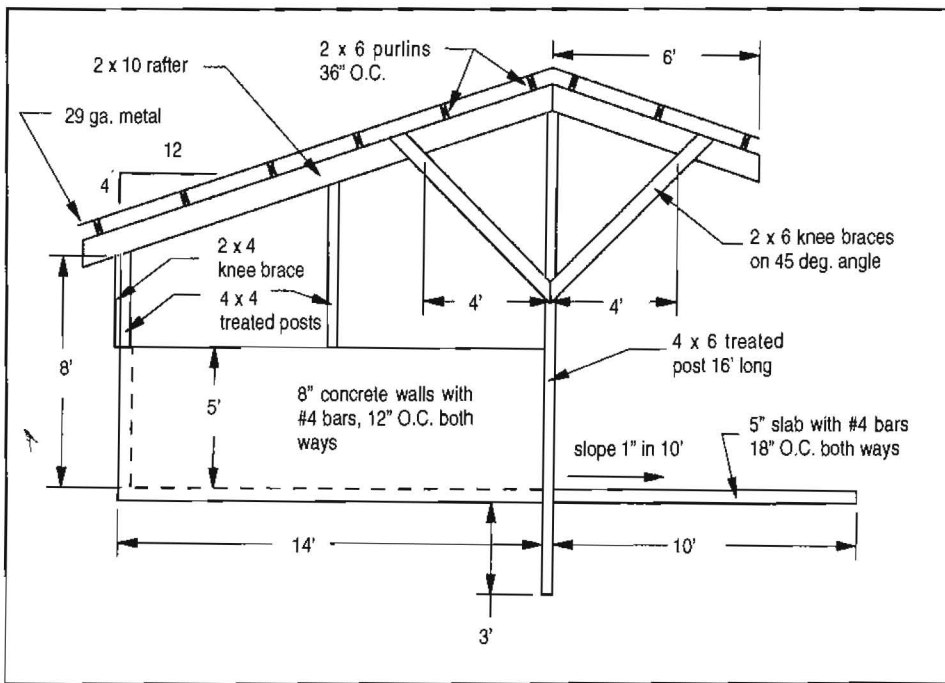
Schematic side view of a roofed composter with concrete bin walls.
